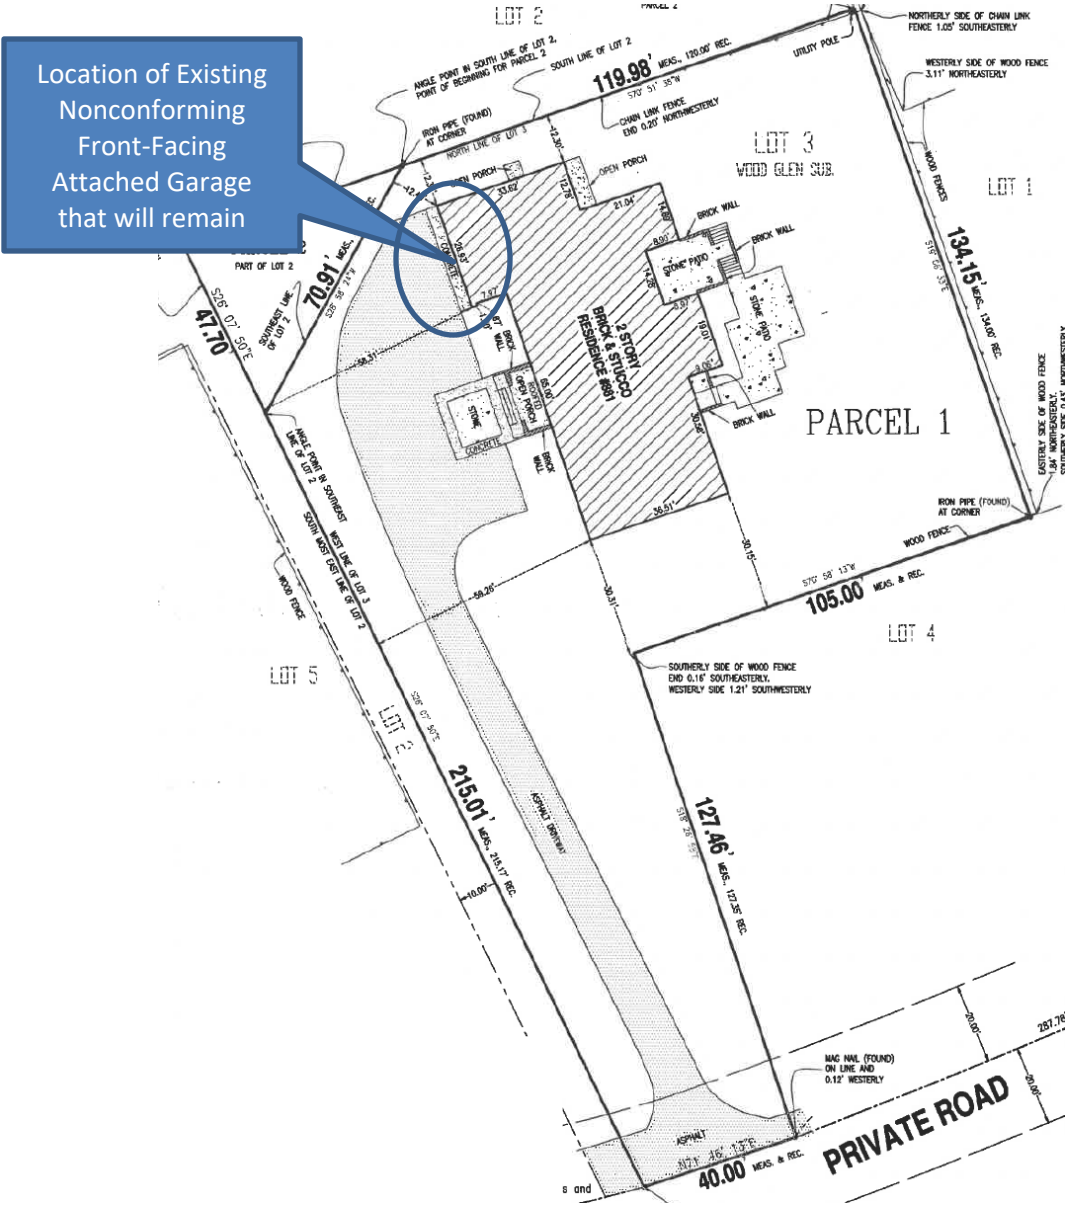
Excerpt of 881 Private Road Plat of Survey
